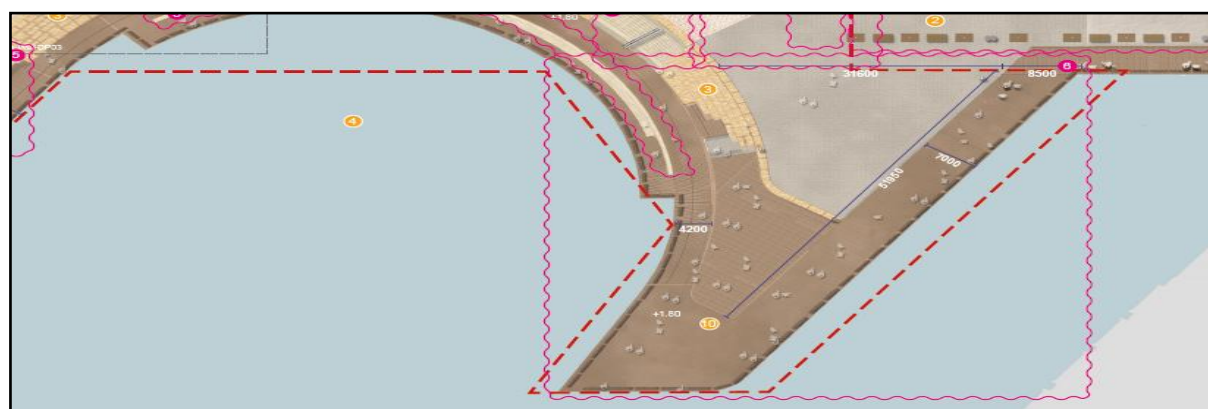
| The proposed pier at Watermans Cove (Source: Applicant)
